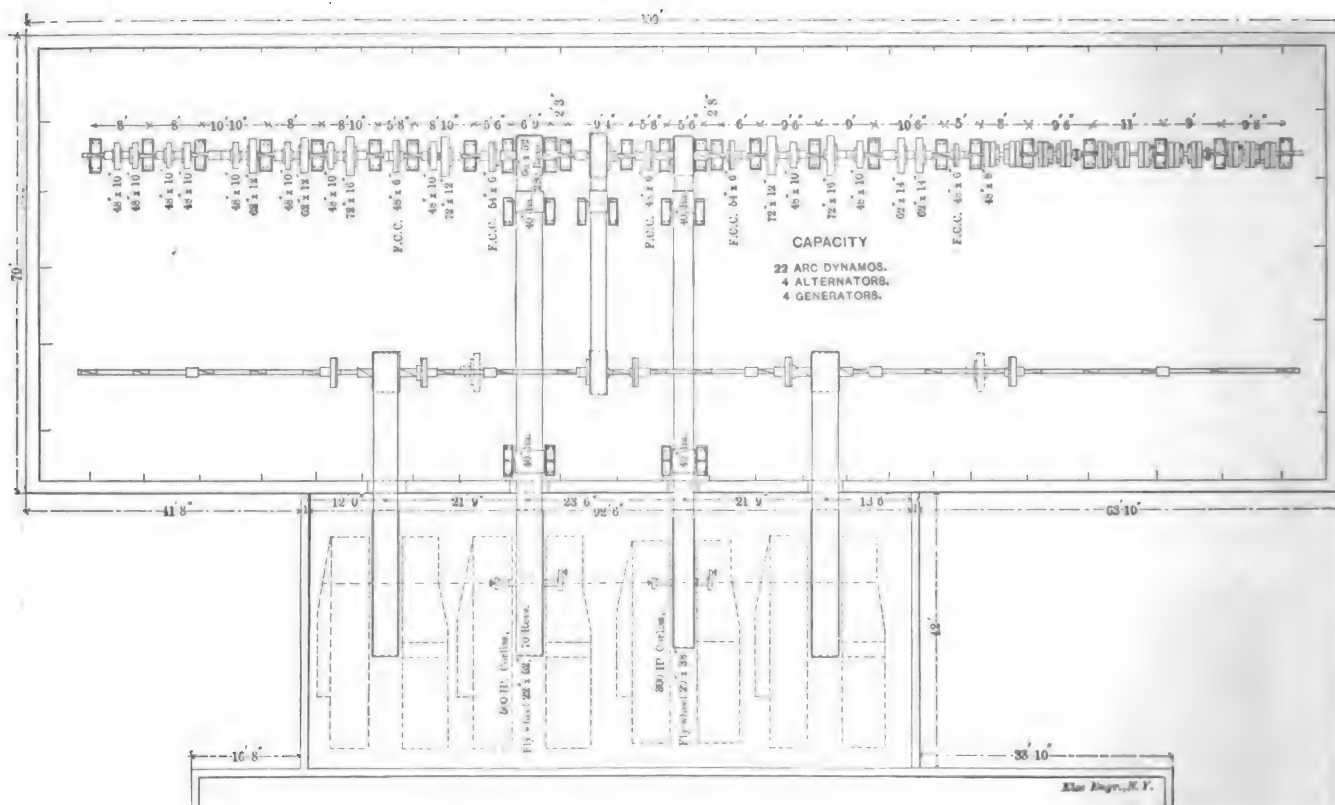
PLAN OF SHAFTING ARRANGEMENT, WORCESTER ELECTRIC LIGHT STATION.
